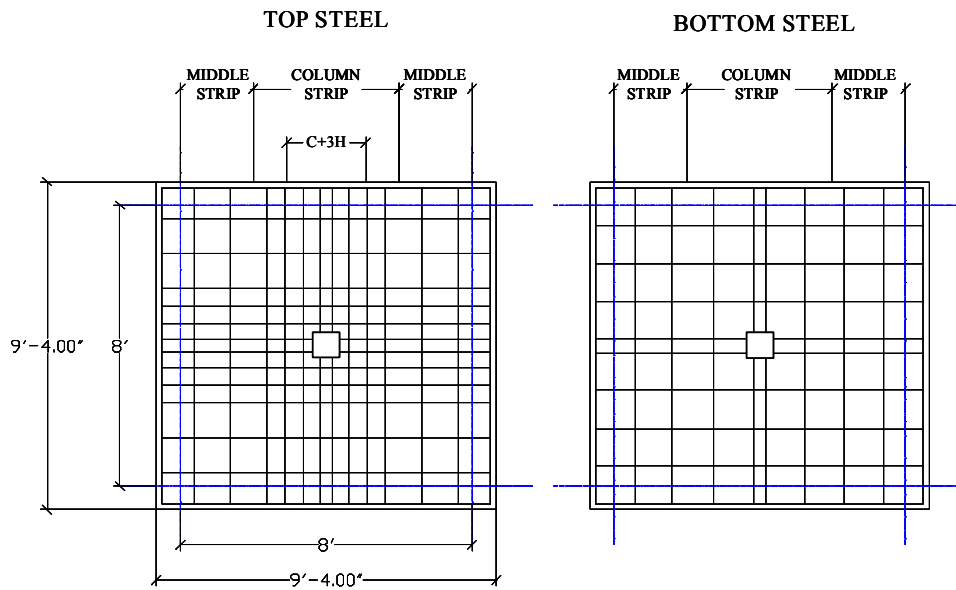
Test Specimen Top and Bottom Mats of Longitudinal Reinforcement
